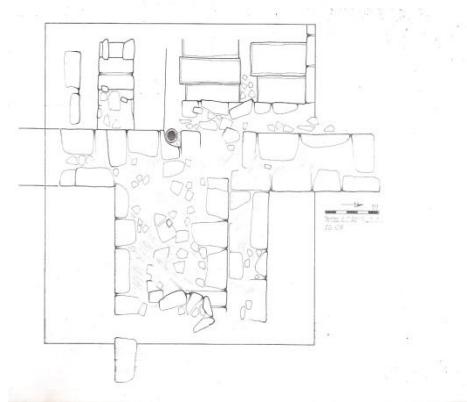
Wall in the proposed bath with details of construction and possible mud brick floor
